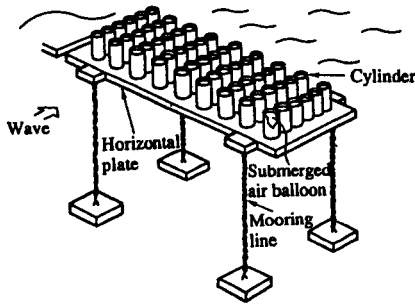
Submerged balloons with cylinders and horizontal plates
